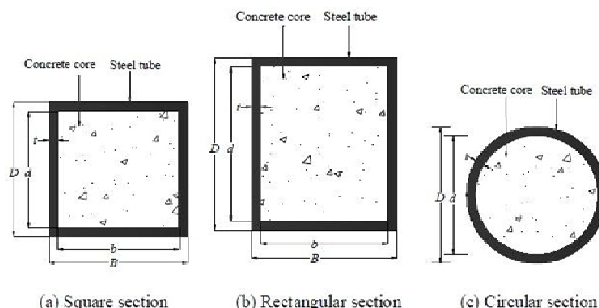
Cross-sections of concrete-filled steel tubular beam-columns.
